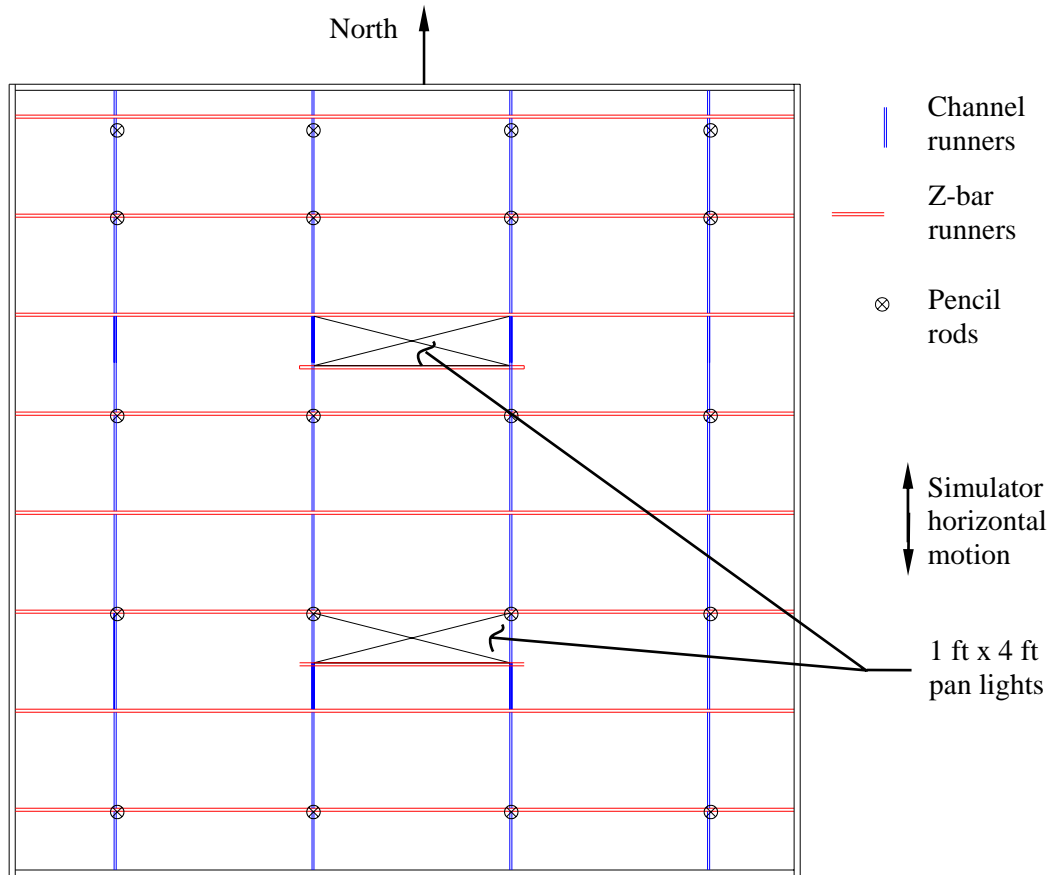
Layout of main supporting members in ceiling system CS3.
